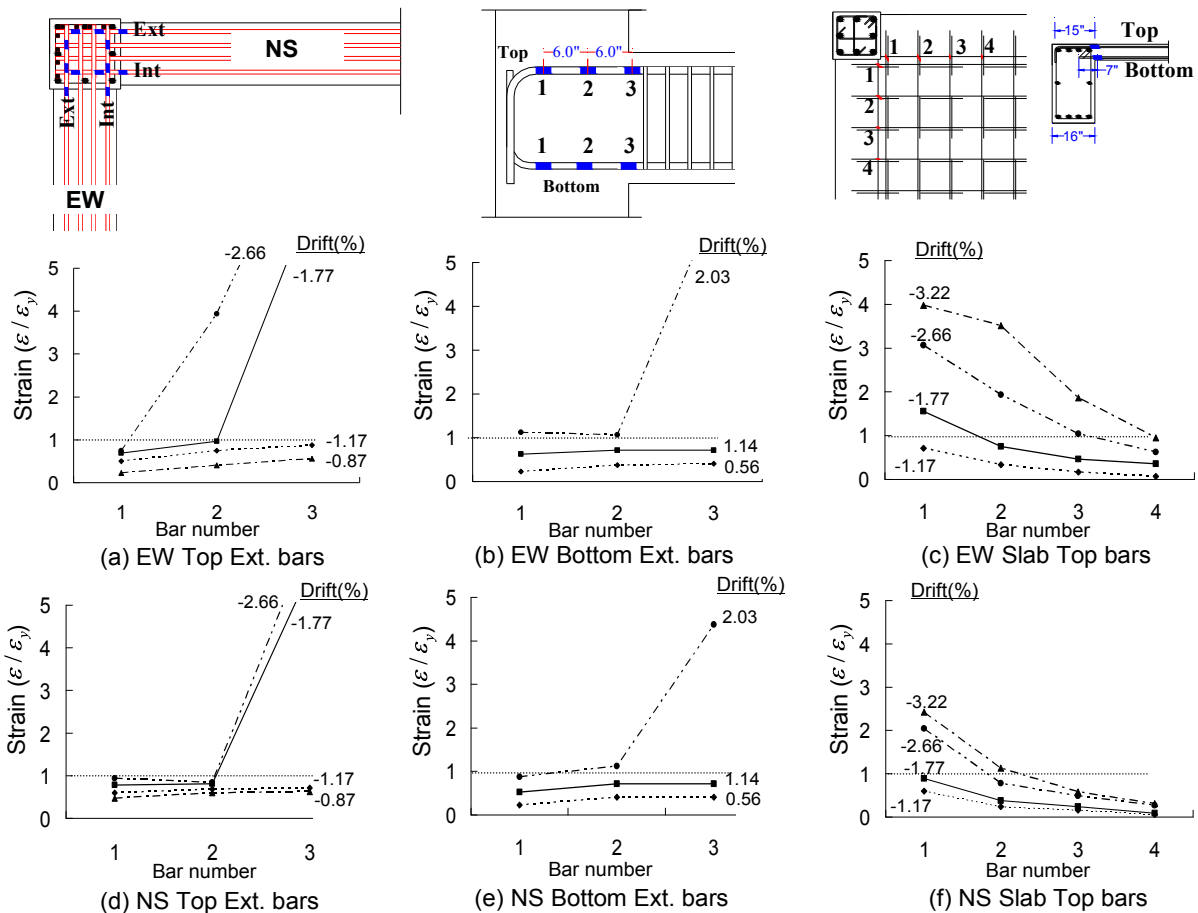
Measured strains at peak drifts of the beam and slab reinforcing bars of specimen SP1.
